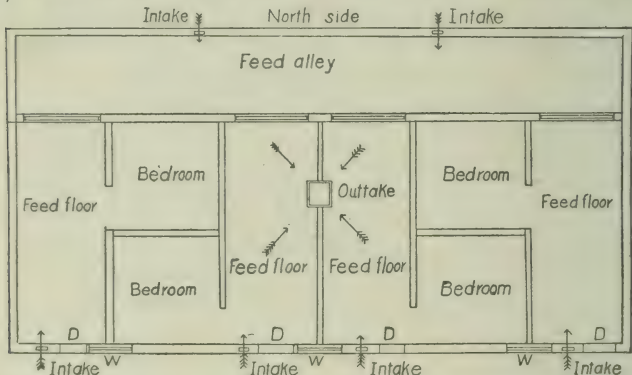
Showing floor-plan and ventilation of a piggery. The outtake extends to within 12 inches of the floor and admits air on four sides.
